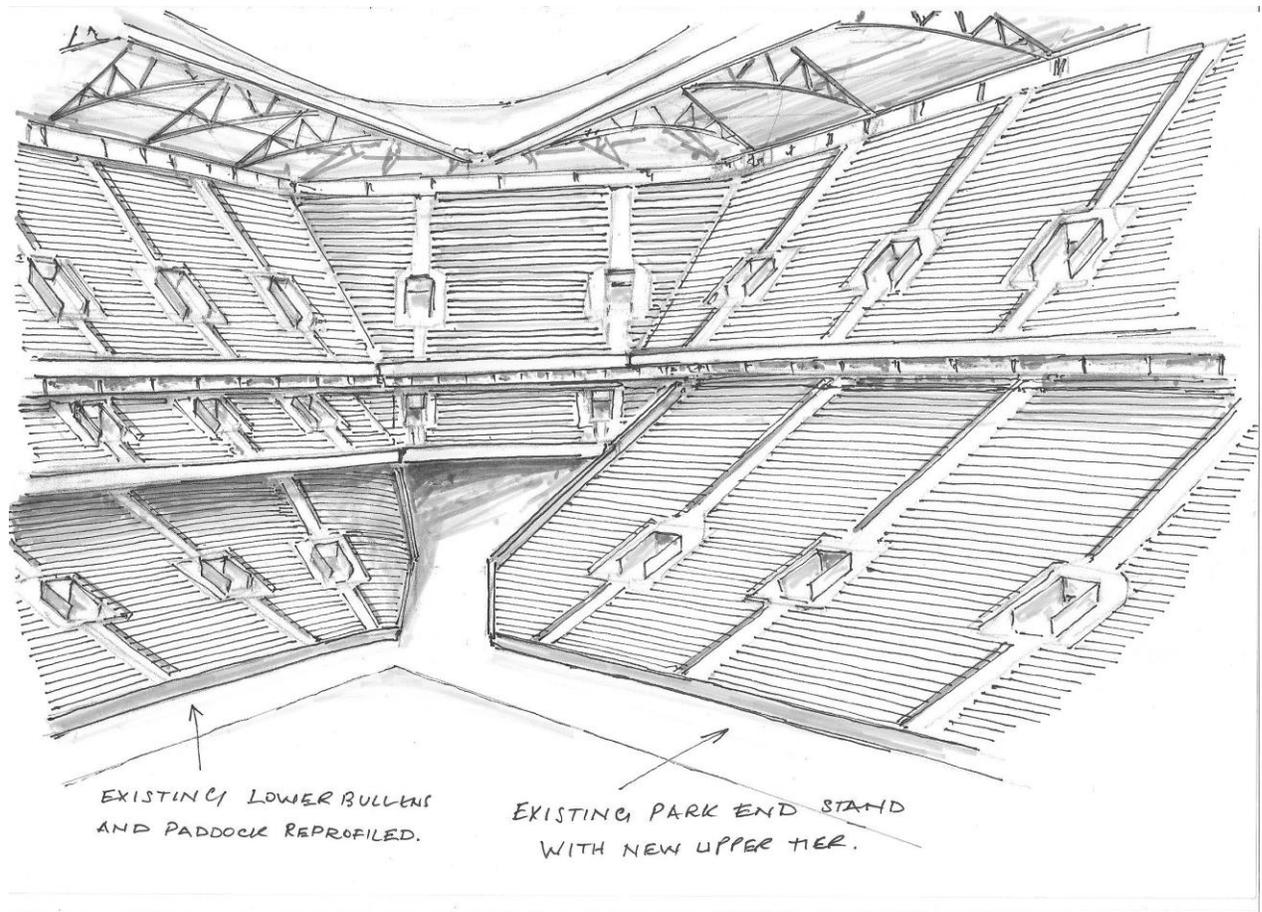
Extended Upper Bullens with corner section and Two Tier Park End Stand
